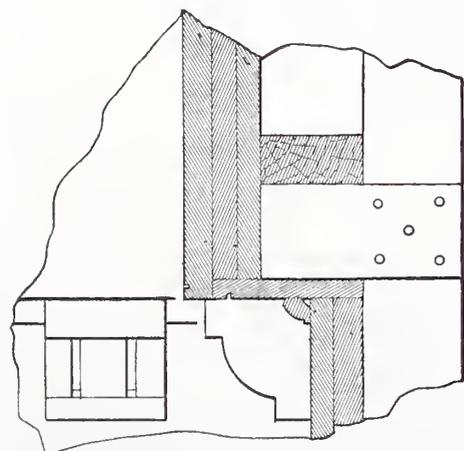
Detail of Finish Over Outside Doors in Loft.—Scale, 1 1/2 Inches to the Foot.
